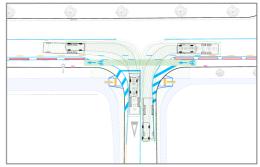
Example of Side Road Treatment for one-way cycleway with tracking (Source: Auckland Transport)
